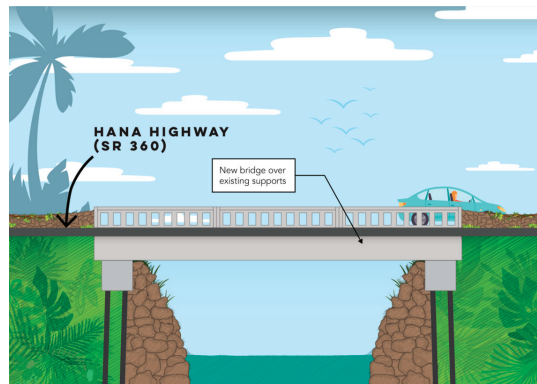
Artistic schematic of a typical longitudinal section of the proposed Hana Highway bridges. (Source: FHWA-CFLHD).
